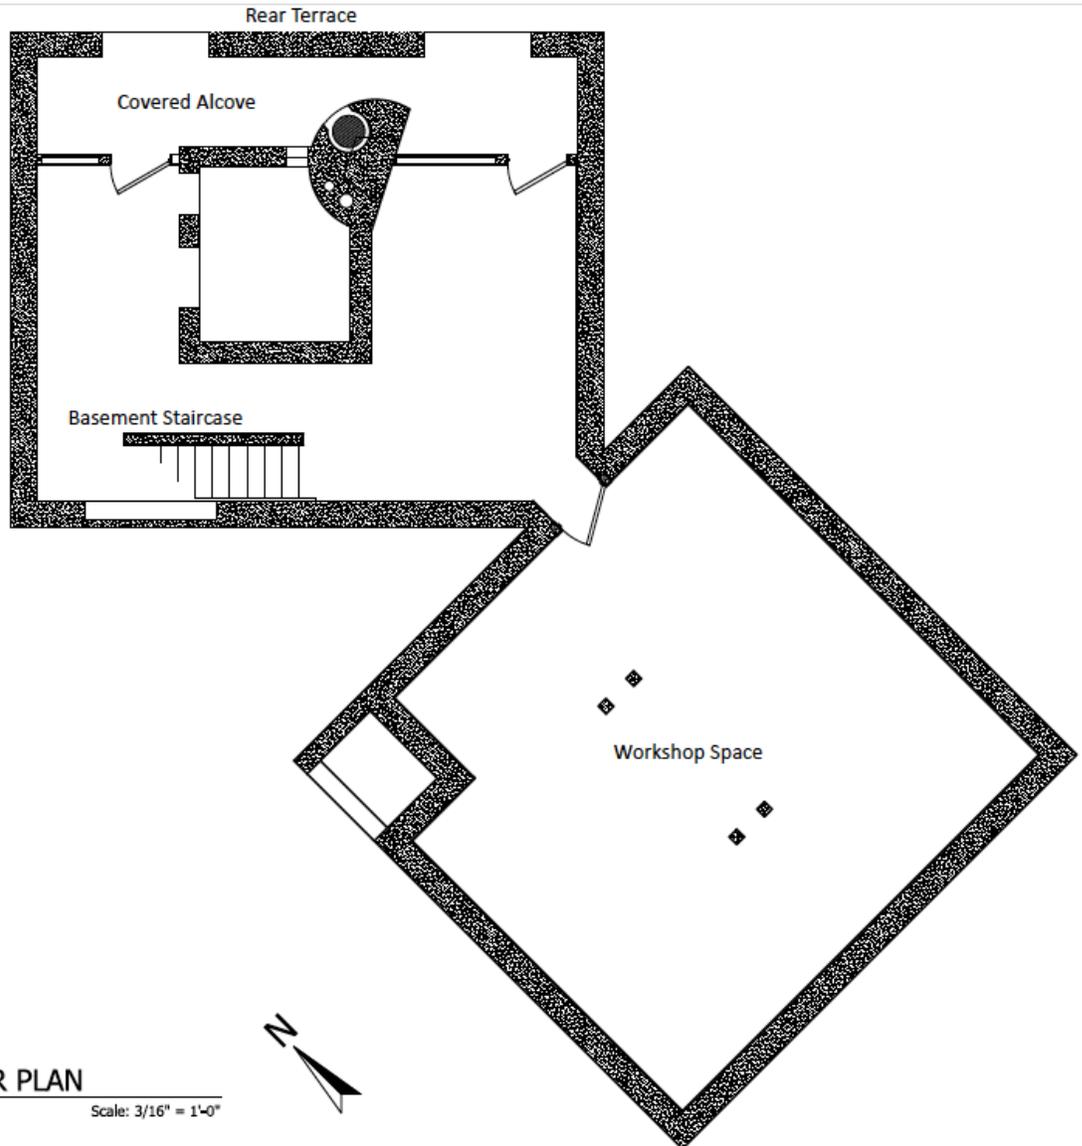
Basement Plan of the Fisher House. CAD Drawing provided by Pierson Booher.
